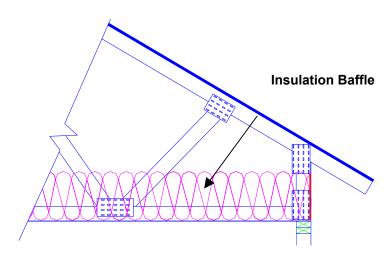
A high-heel roof truss allows for a uniform height of insulation to be placed over the entire ceiling, thereby avoiding a potential cold spot at the perimeter of the wall.
